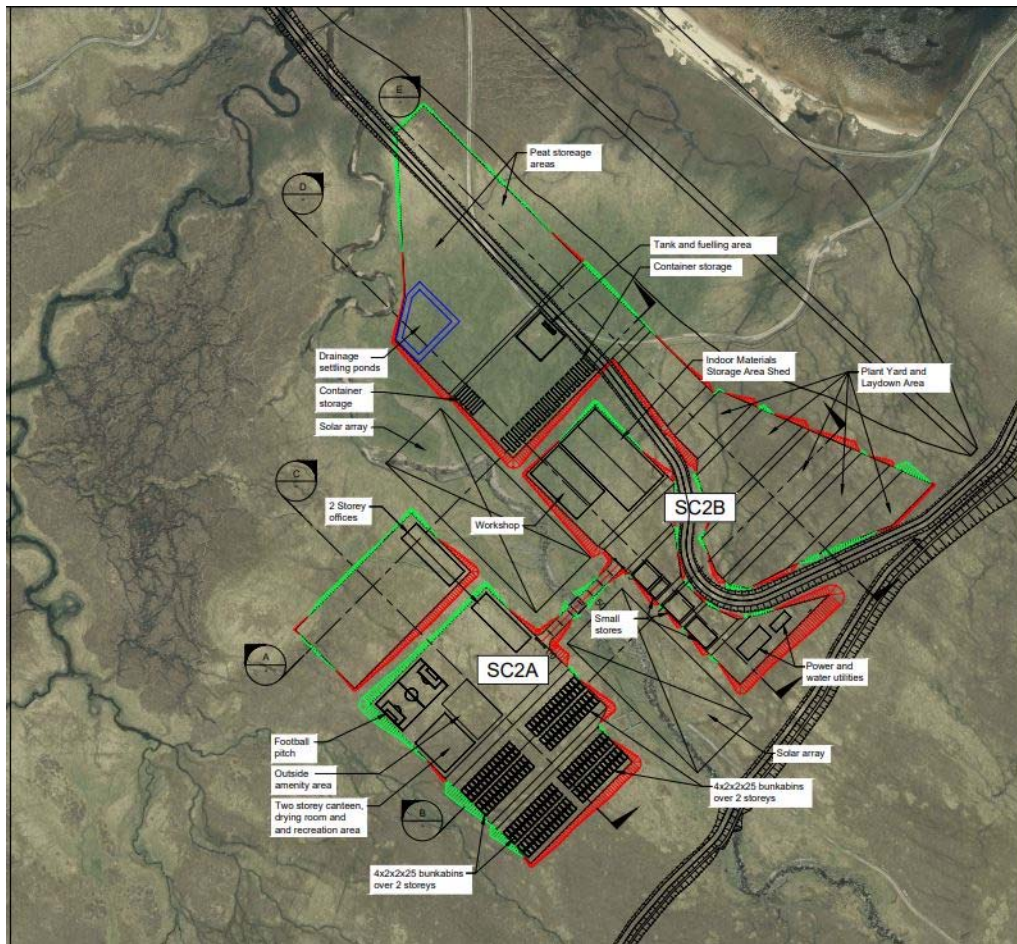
Proposed Layout of Main Site Compound (SC2)
